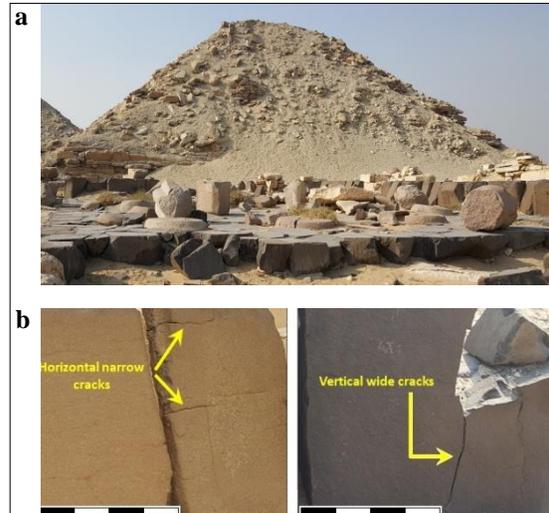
Shows a. remains of basaltic walls and pavements in the temple of Niuserre at Abu Sir, b. horizontal and vertical cracks affected the basaltic walls
